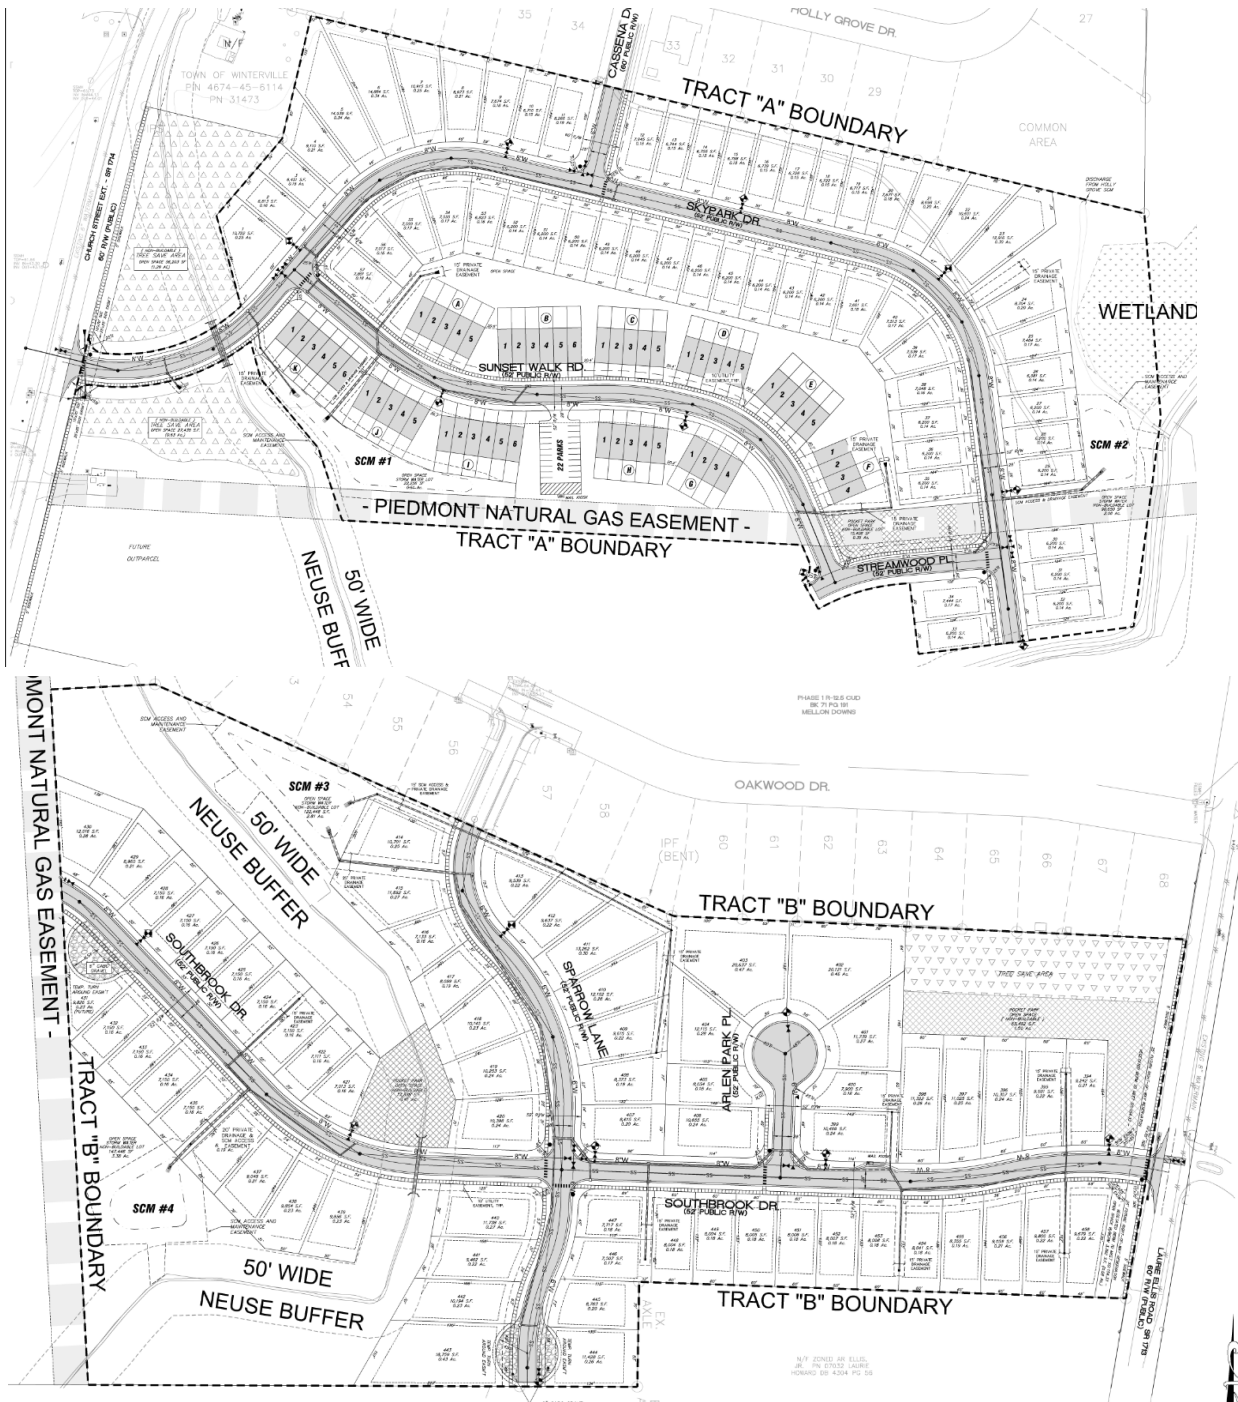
EXHIBIT C PLANS AND SPECIFICATION SOUTHBROOK PHASE 1
